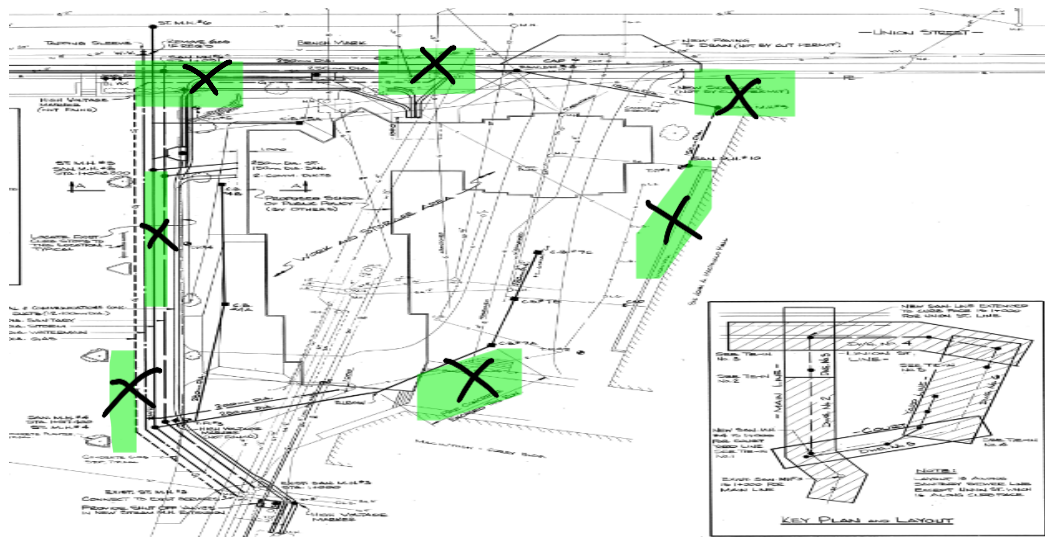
Plan View Sutherland Hall with Proposed Bioswale Locations (Queens Facilities 2024)
